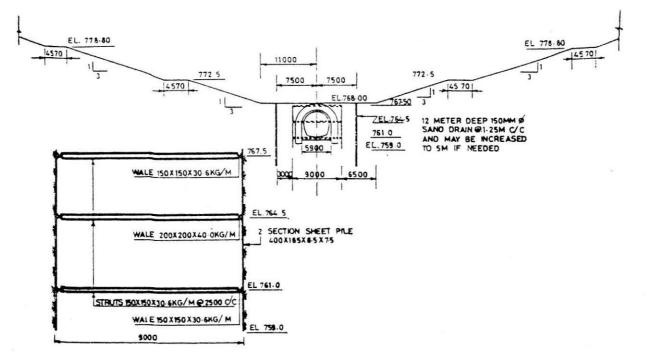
Typical Cross Section of Cut and Cover Section with Sheet Piles (Loktak H.E. Project)
